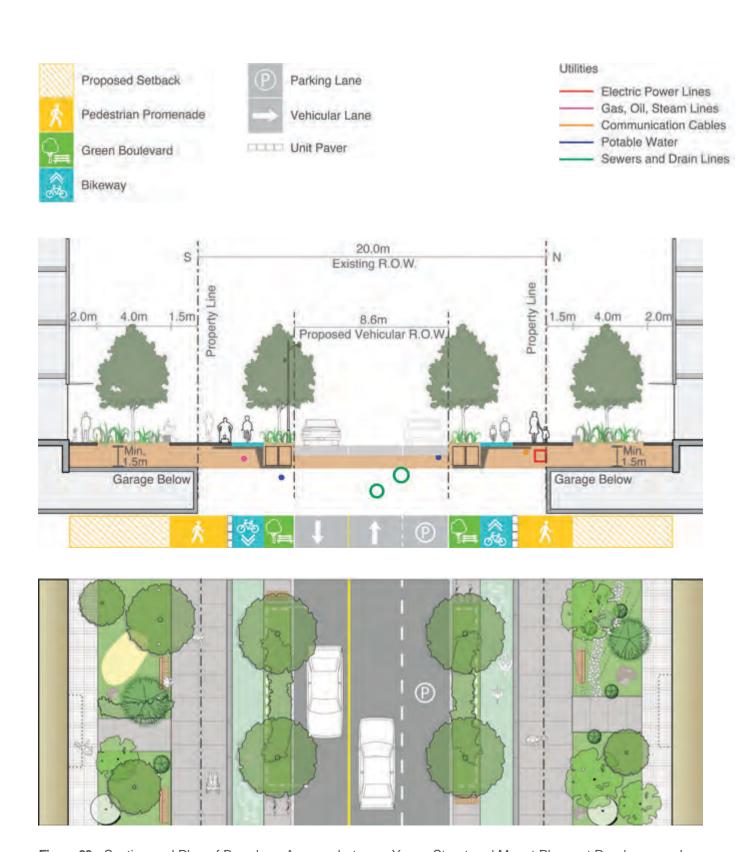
Section and Plan of Broadway Avenue, between Yonge Street and Mount Pleasant Road - general Recommended Final Condition
